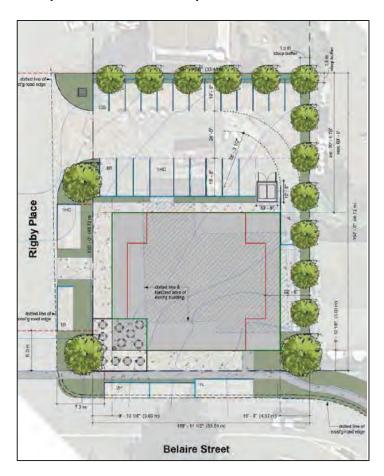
Proposed Site Plan Concept – 336 Belaire St.
